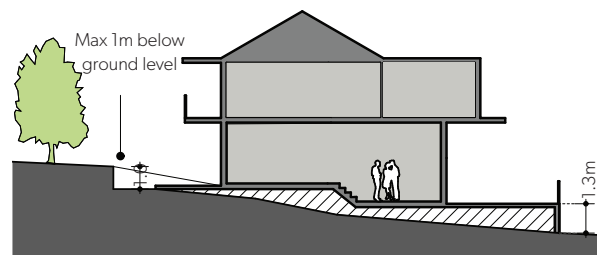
Reduce visual impact and site excavation by providing split levels which work with the fall of land
